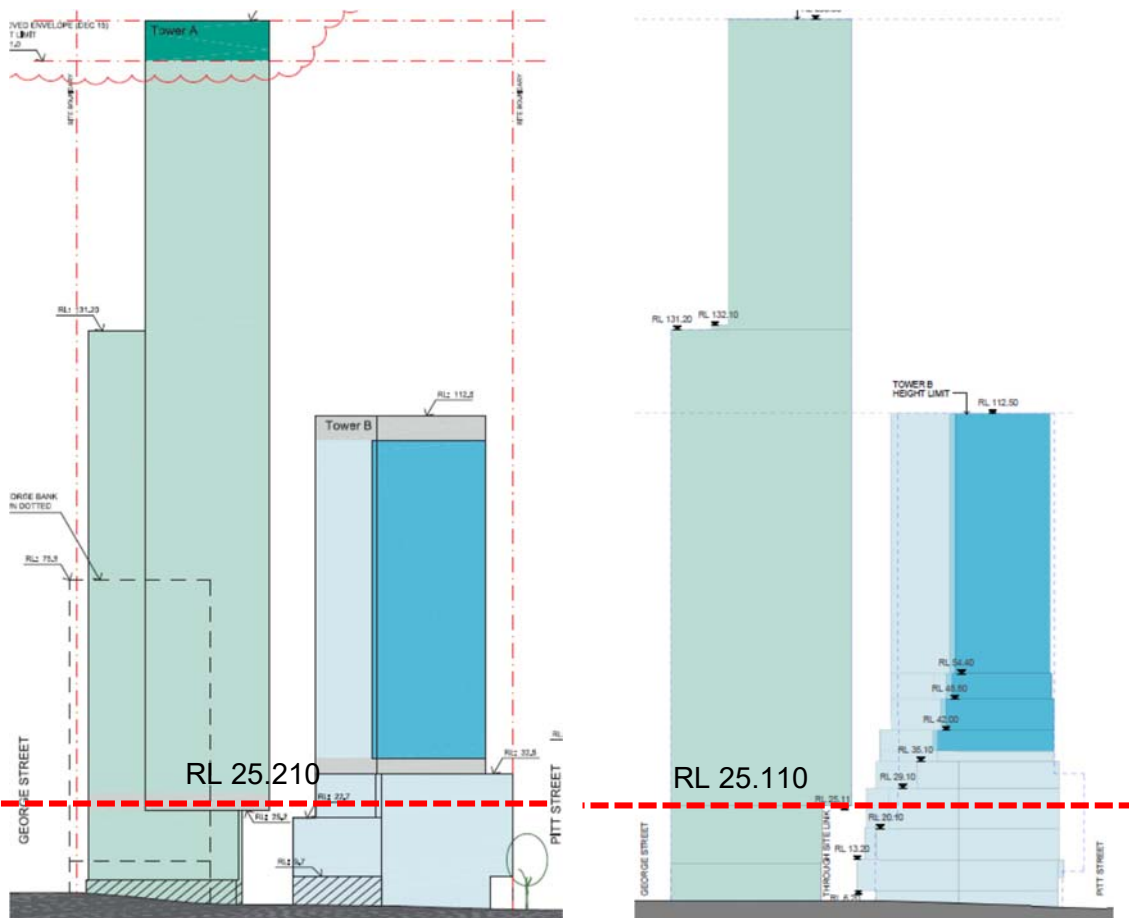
View of approved southern elevation (l) and proposed southern elevation
